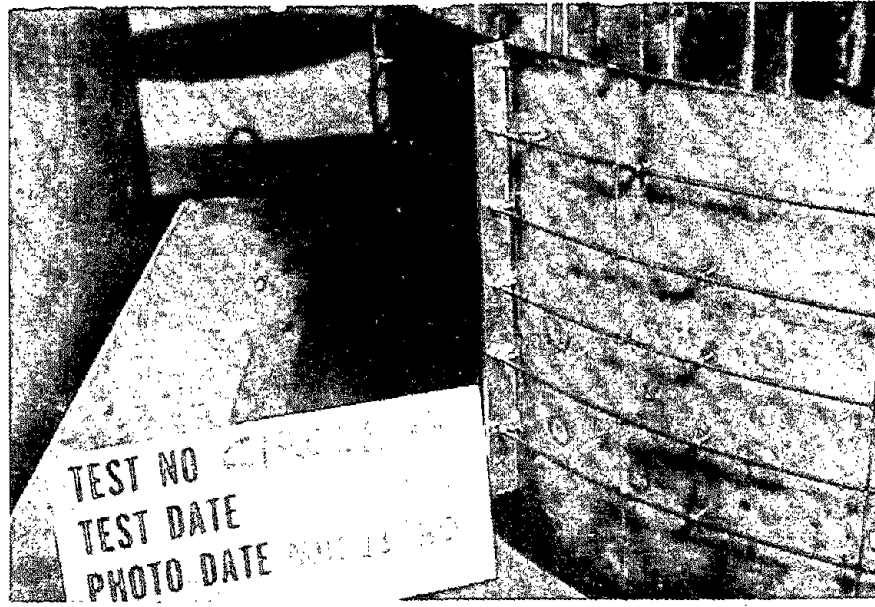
REINFORCEMENT AND JOINT DETAILS, CIRCLE-4
